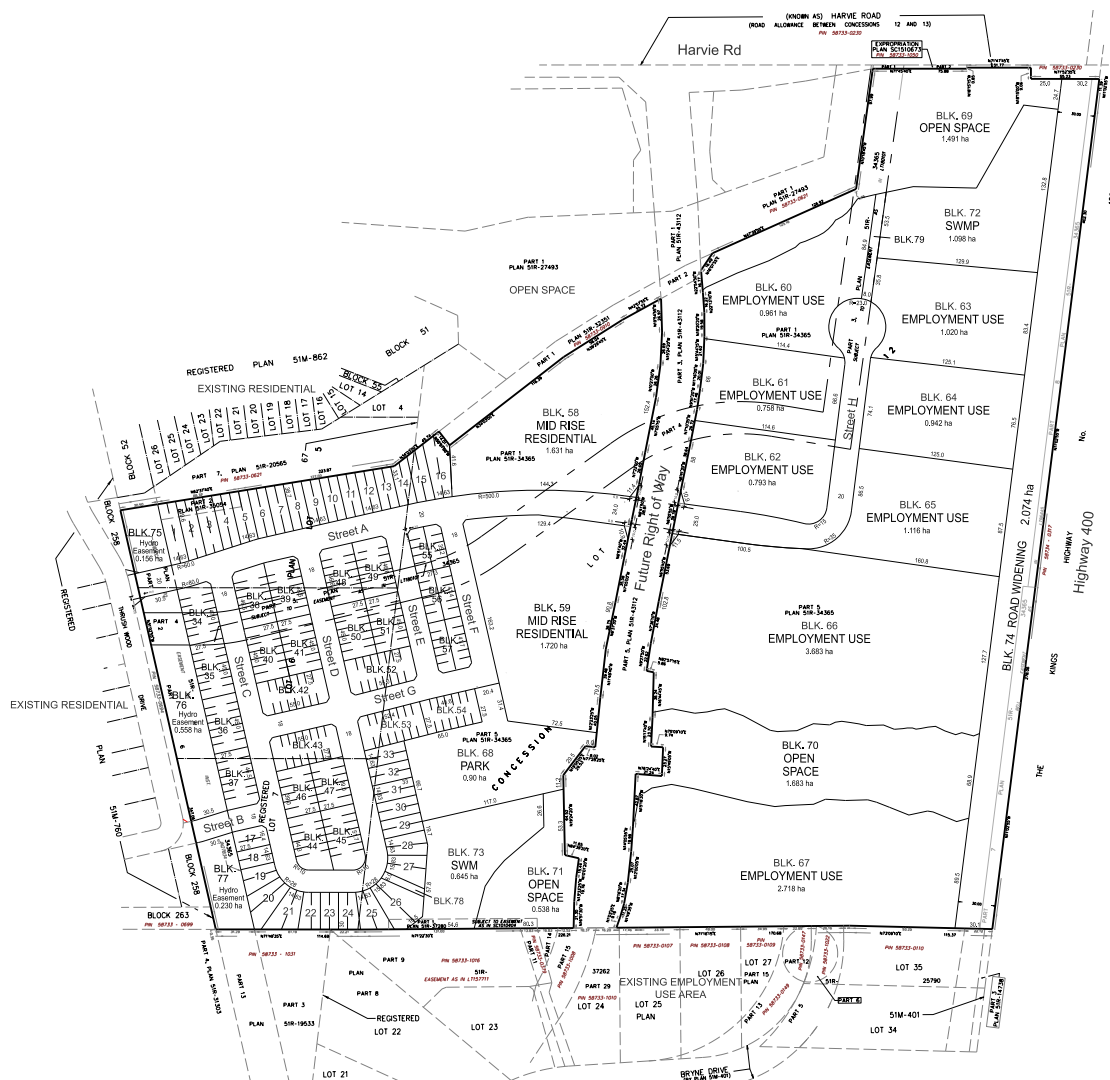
Draft Plan of Subdivision prepared by Weston Consulting
